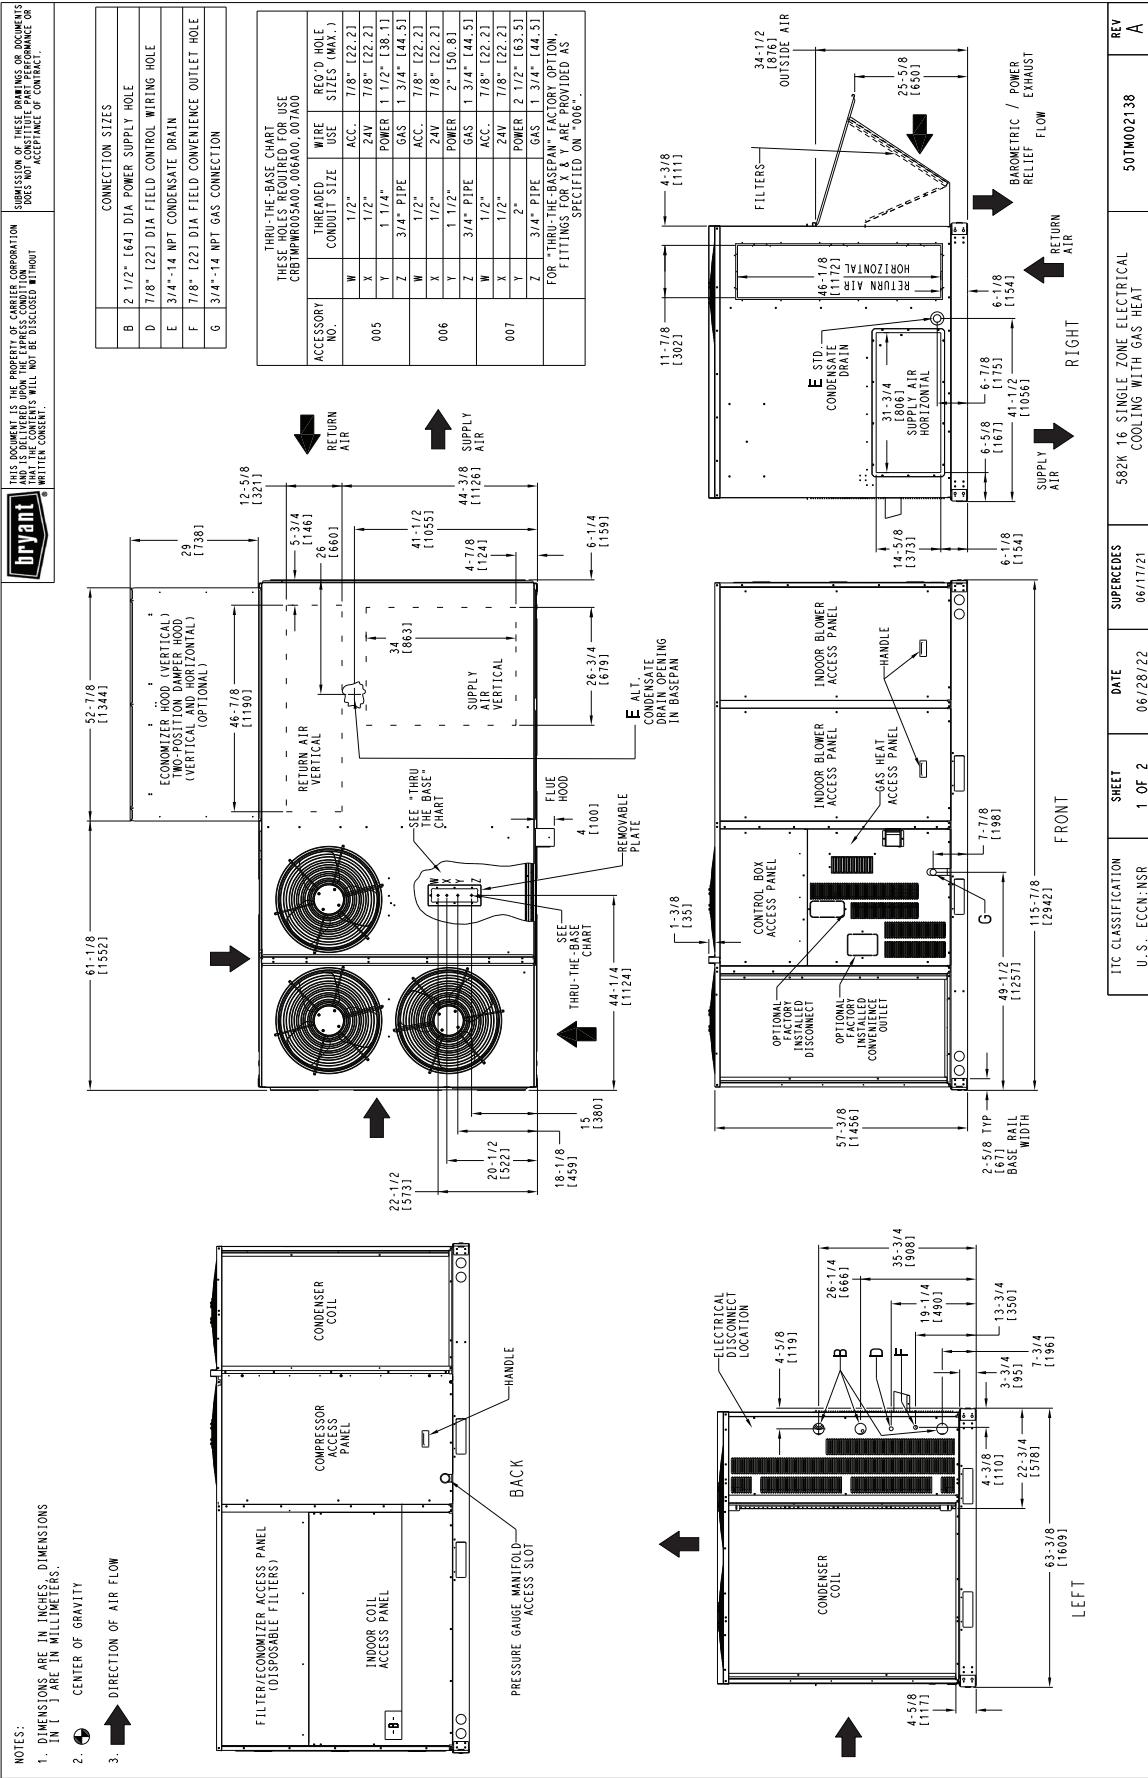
582K\*\*16 Unit Dimensional Drawing
